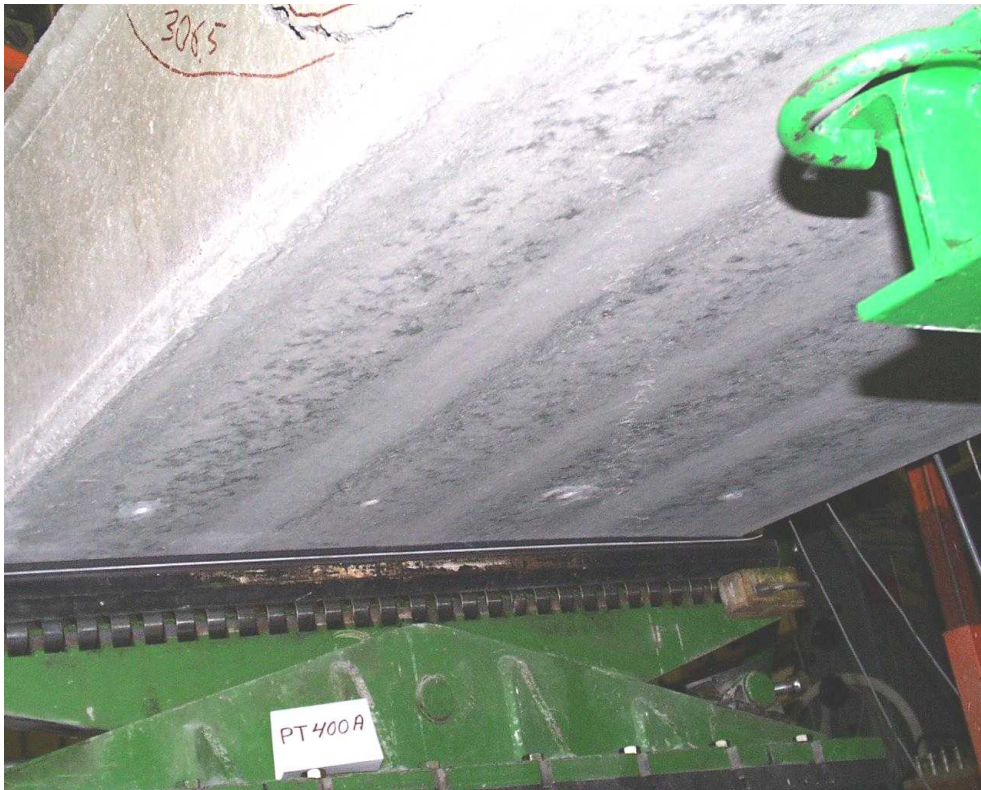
PT400A. Cracking pattern at the soffit of the slab.
